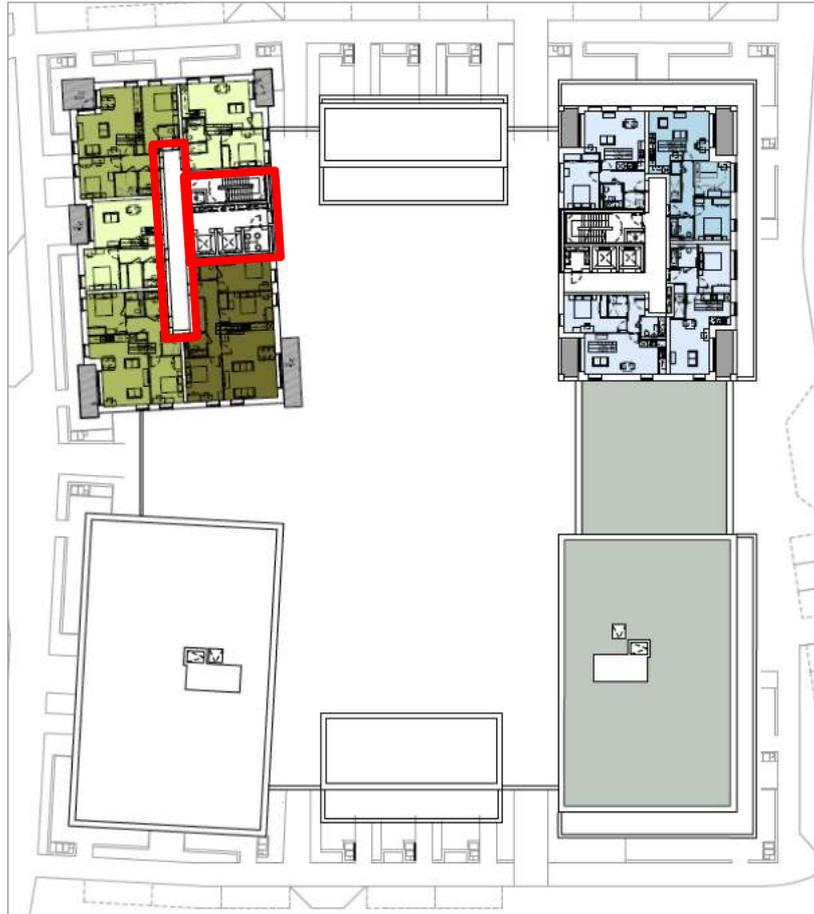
Block E 11th floor, top floor communal Corridor (Patel Taylor drawings 21.09.2020).
